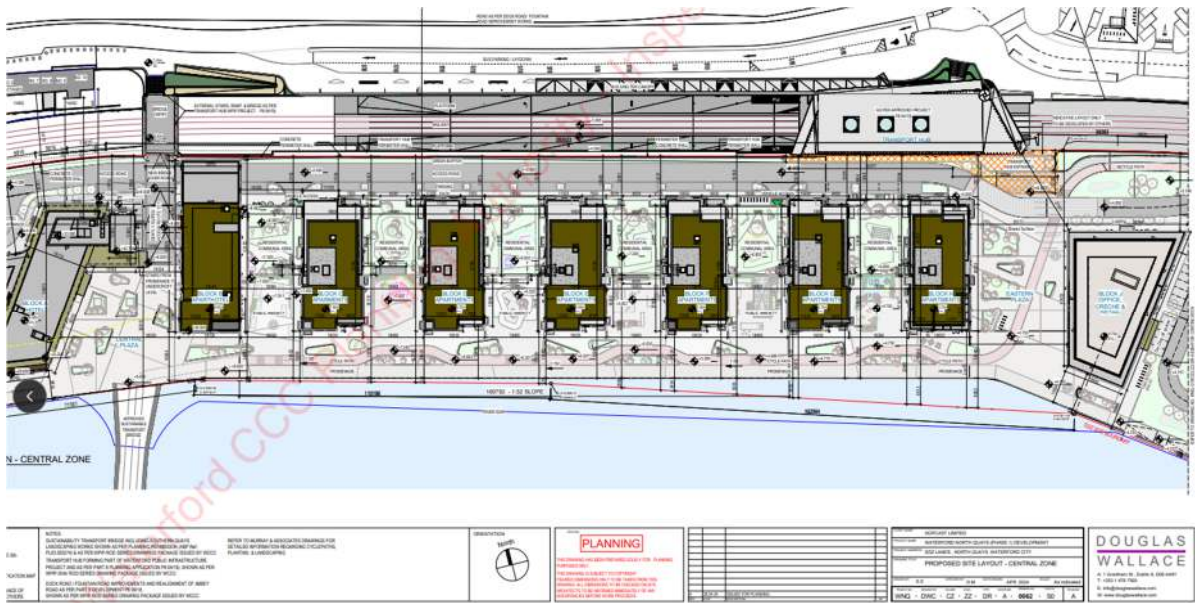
Site Layout Plan showing Riverside Pedestrian Promenade and Cycle Way
